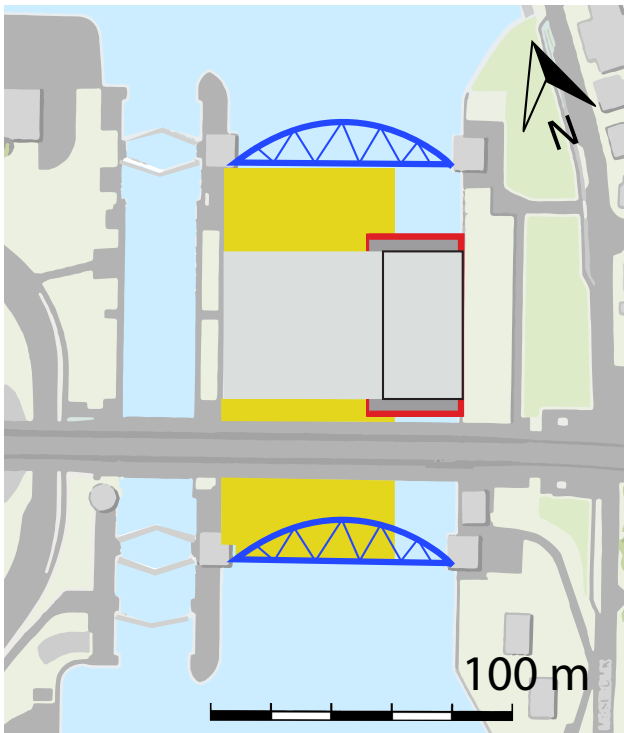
Step 5.1: Construct culvert structure (light grey, with black stroking).
